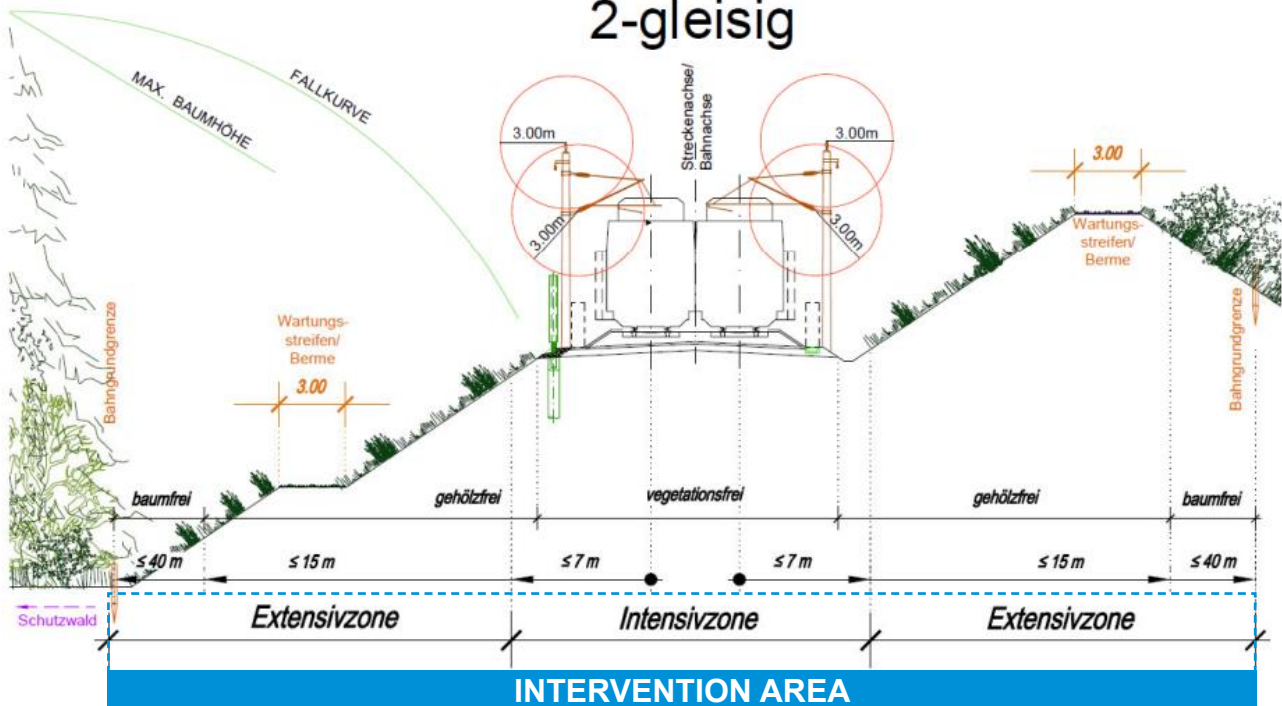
ÖBB-Railway track lateral cut – new built double tracked line, with noise protection embankment
